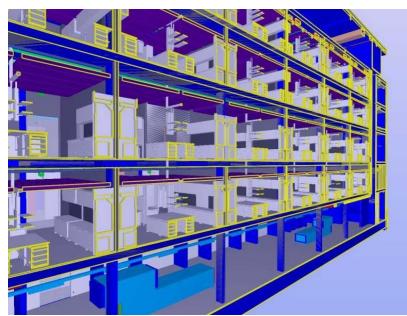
As a pilot project at ETH Zurich, the HIF renovation and extension will be planned using information modelling. (BIM).
